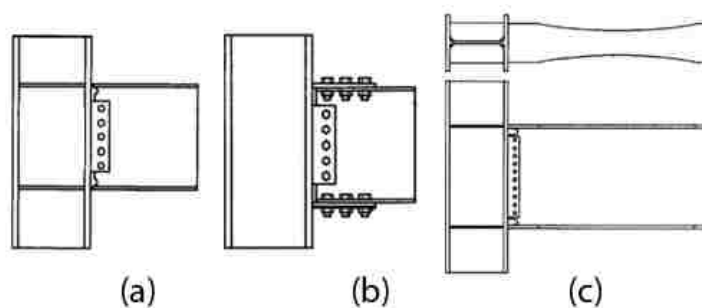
(a) Welded-Flange Connection, (b) Bolted-Flange-Plate Connection, and (c) Reduced Beam Section Connection (Roeder 2002)
